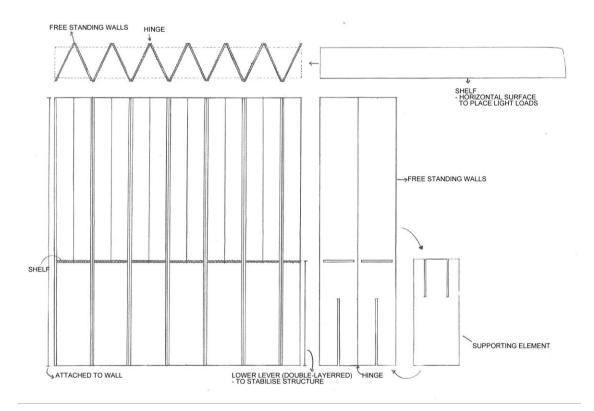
Illustration shows design of sliding partition from plan and elevation views.
